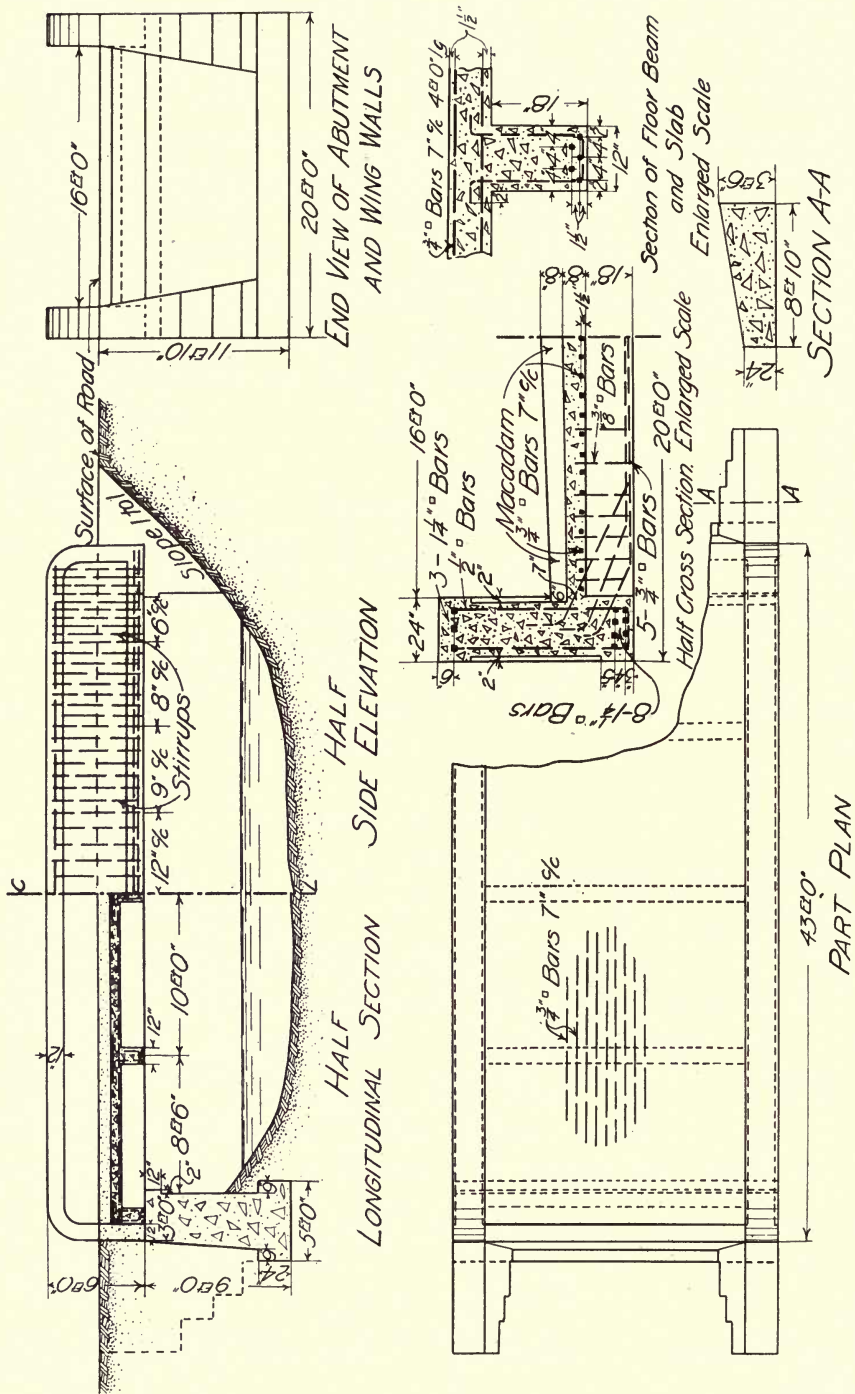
GIRDER BRIDGE WITH SPAN OF 37 FEET.
